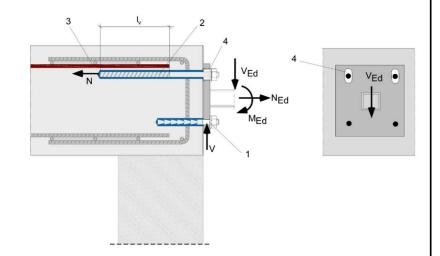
Lap to a foundation of a column under bending. 1. Shear lug (or fastener loaded in shear) 2. Selkent rebar anchor FRA (tension only) 3. Existing stirrup / reinforcement for overlap (lap splice) 4. Slotted hole
